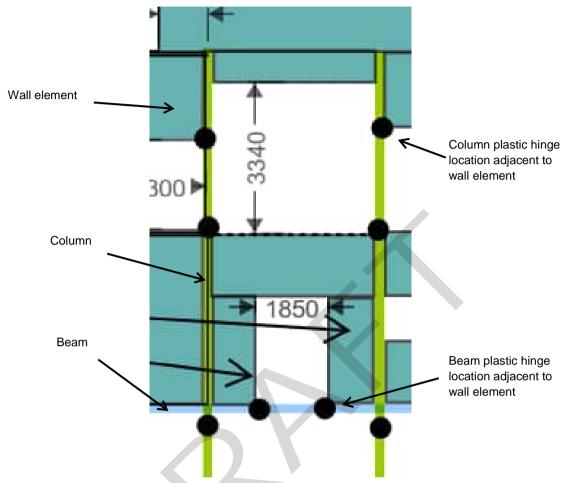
Extract from drawing B.21, showing plastic hinge interaction with wall elements
